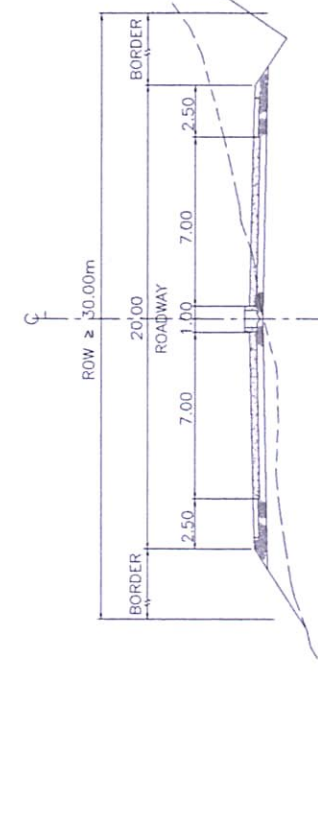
WIDENING OF EXISTING ILIGAN-CDO-BUTUAN ROAD
